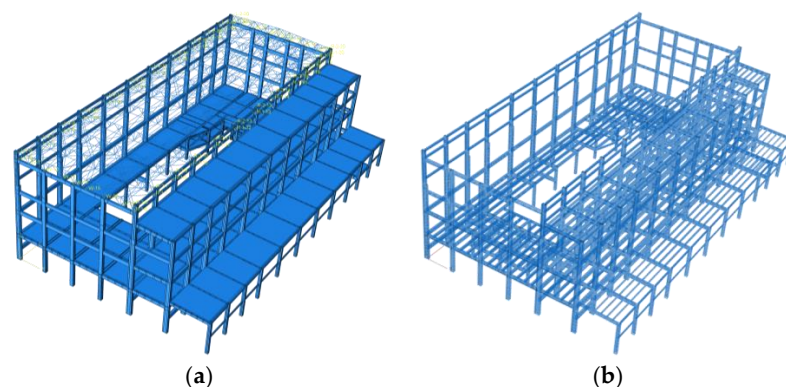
Finite element model of SRC frame-bent turbine main building. (a) Overall model. (b) Section steel and rebar skeleton model.
